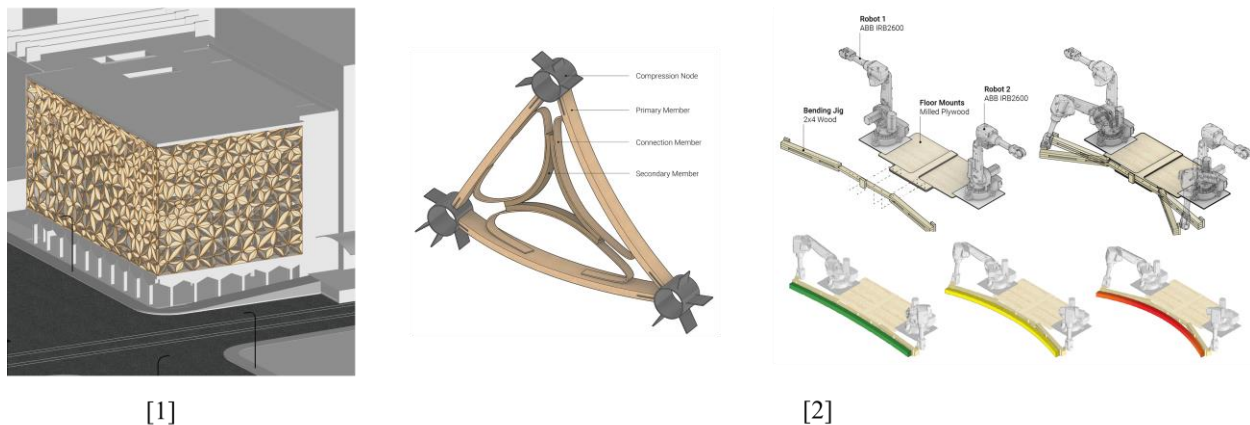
Proposed high-performance facade based on automated timber construction for the CBDL building, Calgary. 1) Overall view for south and west facades. 2) Fabrication system.
